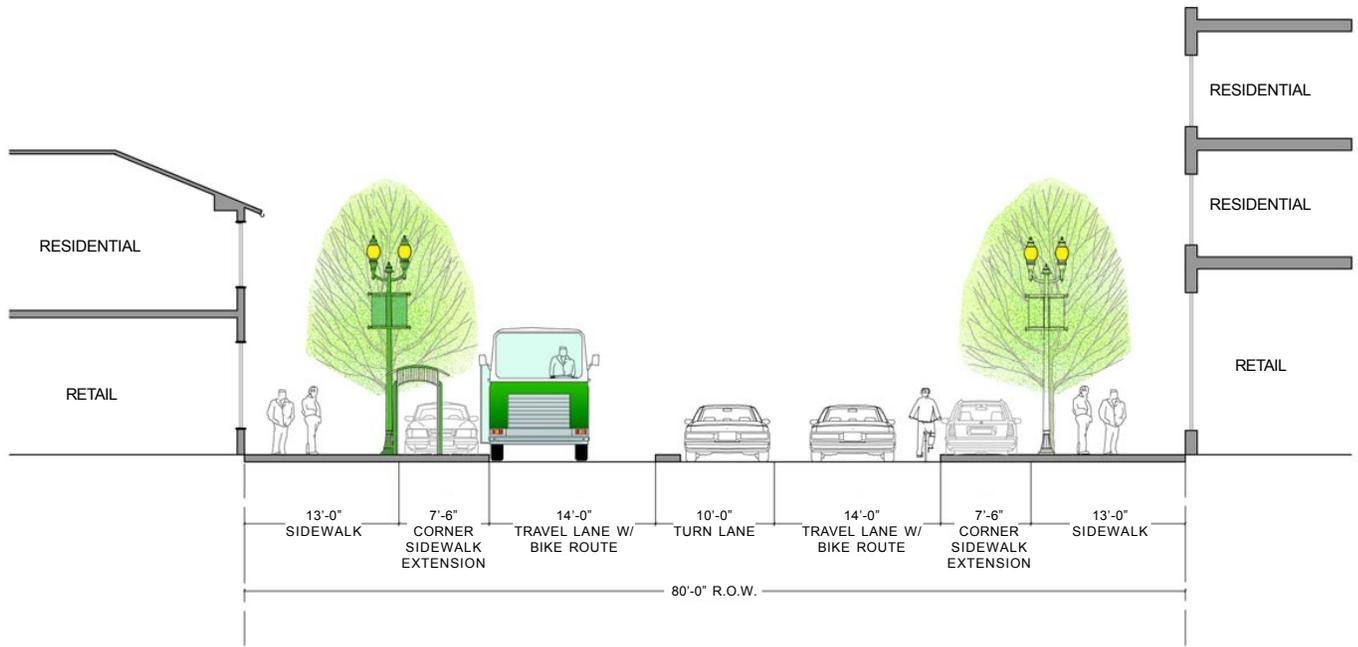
Illustrative 13th Street Streetscape Improvements
